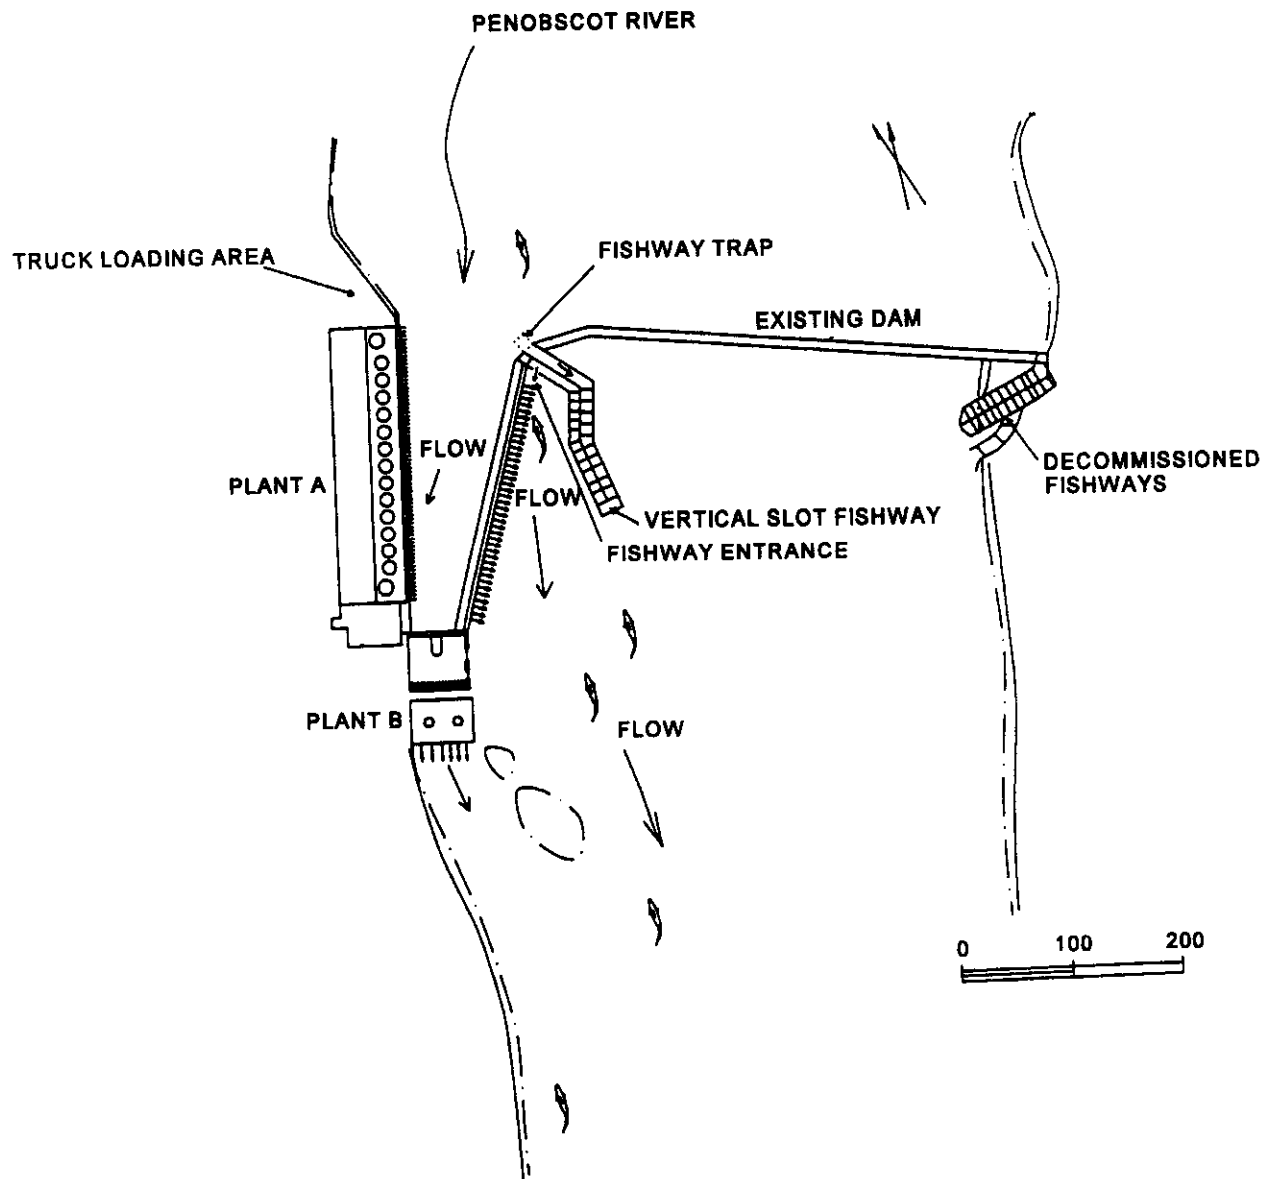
General site plan for Veazie Dam showing existing fishway and water flows (Source: Truebe 1993).
